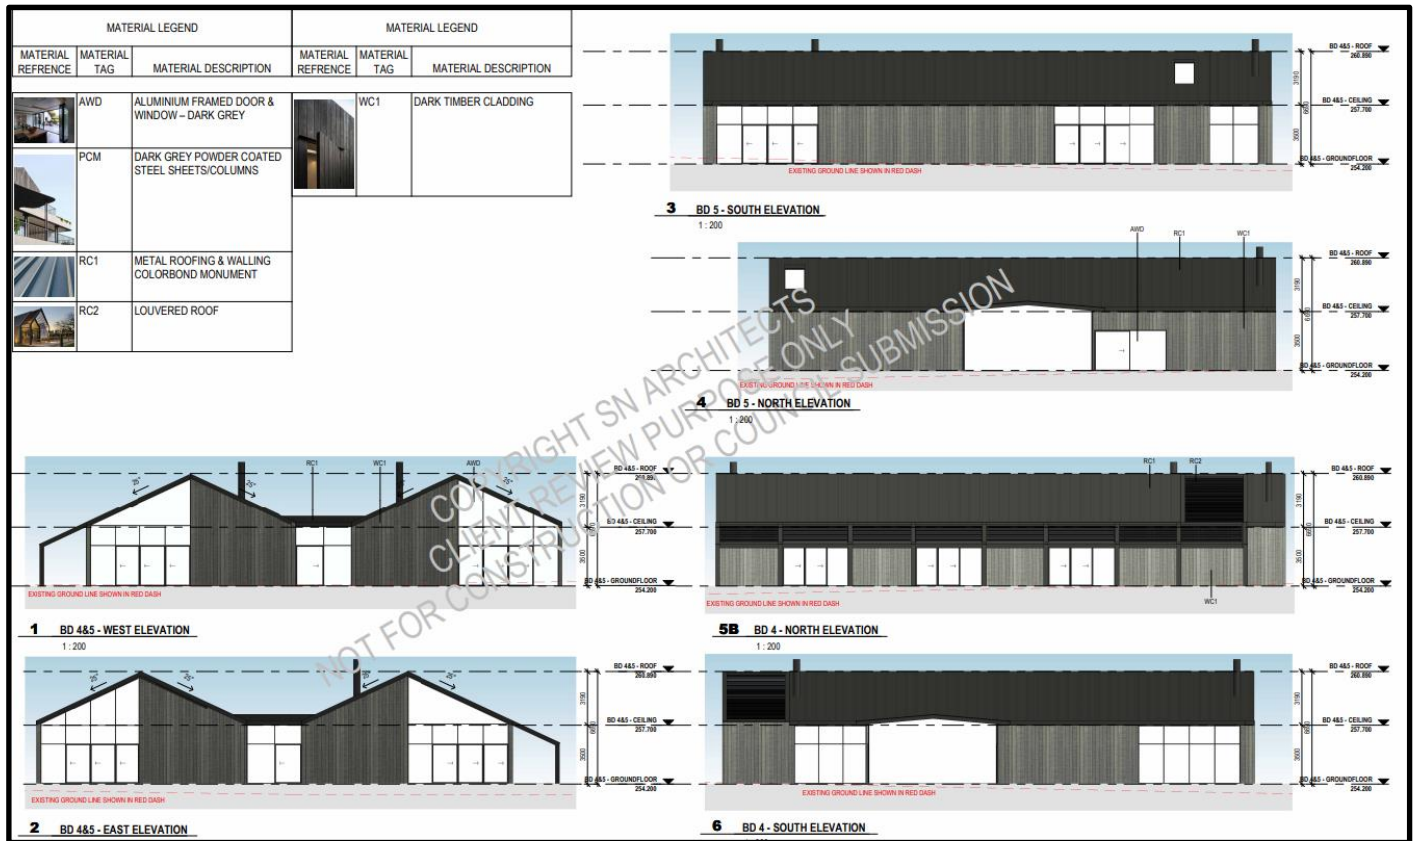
F&B Outlets / Indigenous Cultural Centre Elevation Plan (Source: SN Architects)
